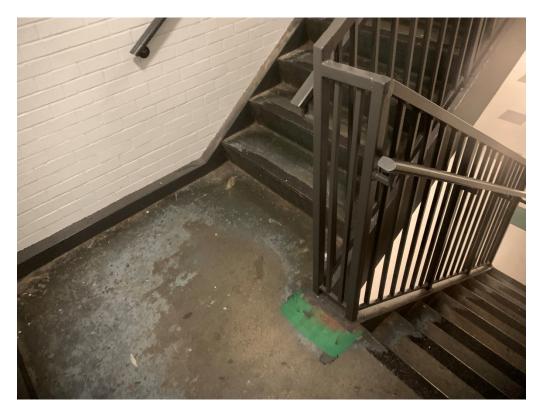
Handrails do neither return to wall or are continuous per drawings
